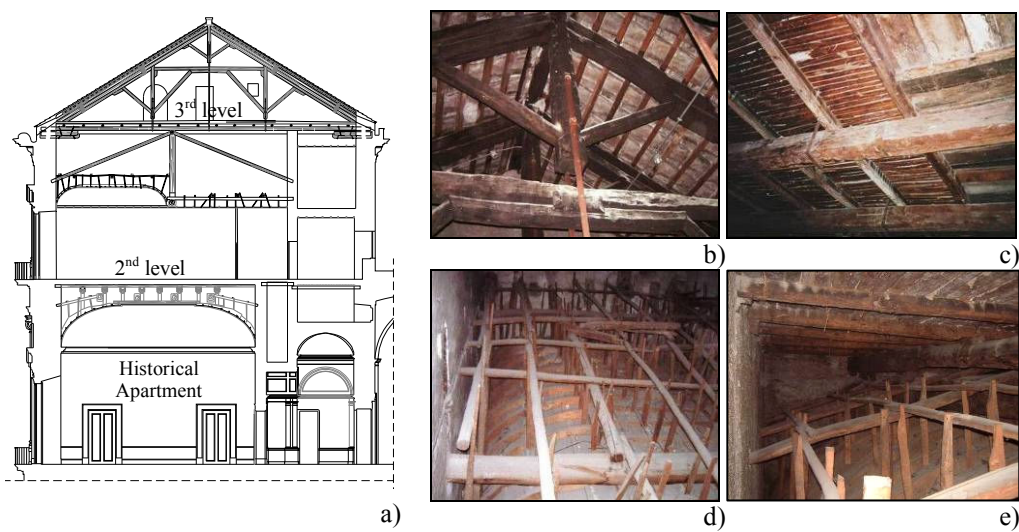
Royal Palace of Naples – Timber structures: a) Section A-A; b) Roof trusses; c) Beam floor at 3rd level; d) Vaulted ceiling at 3rd-2nd level; e) Complex structure at 2nd level.
